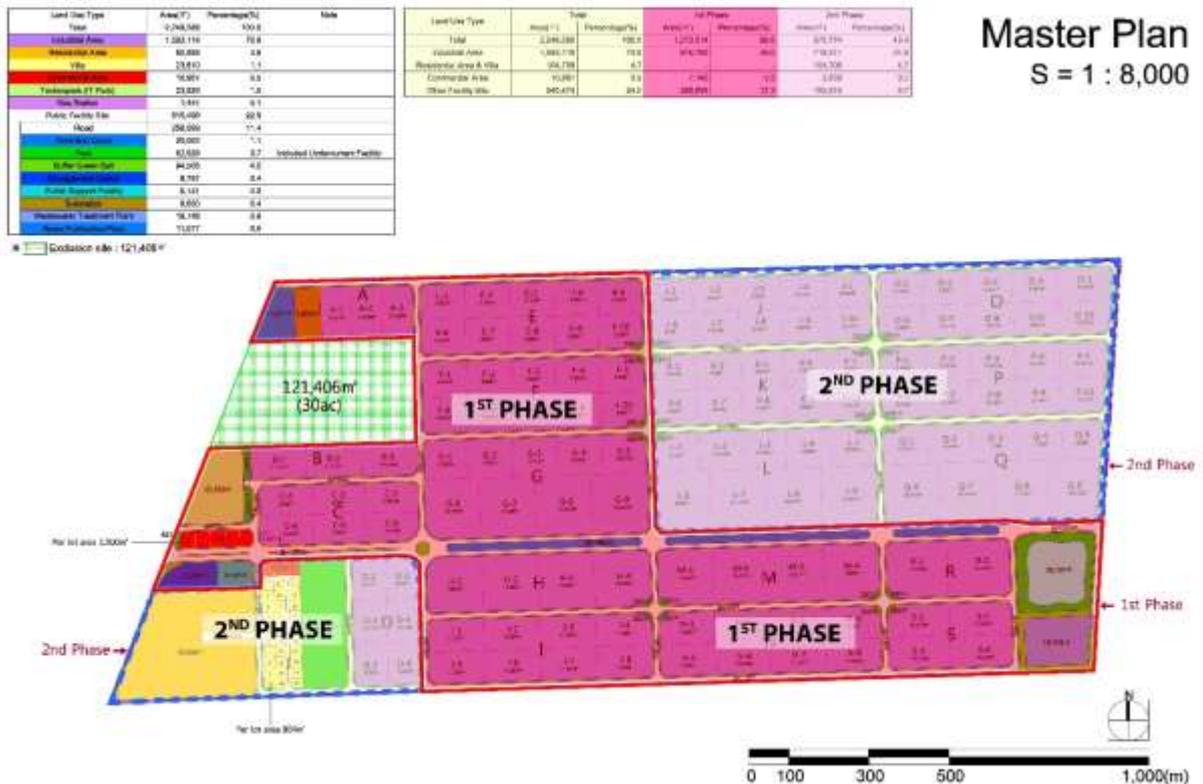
Project Layout Plan (See large map A3 size in Appendix)
